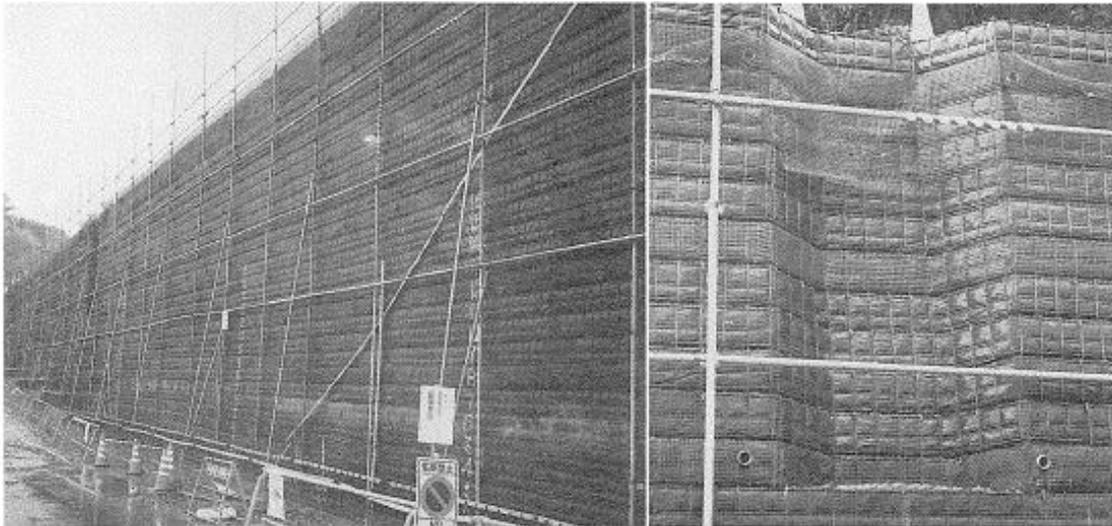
Welded steel fabric acting as temporary facing support
